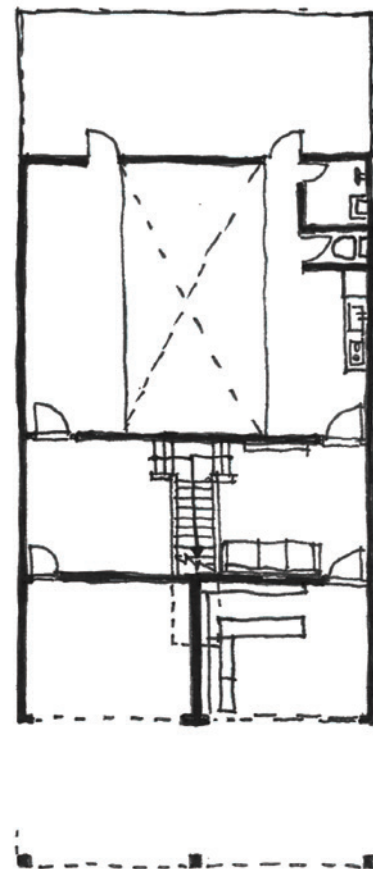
Ground floor plan of Mr. Wan's house (screenshot by author)
